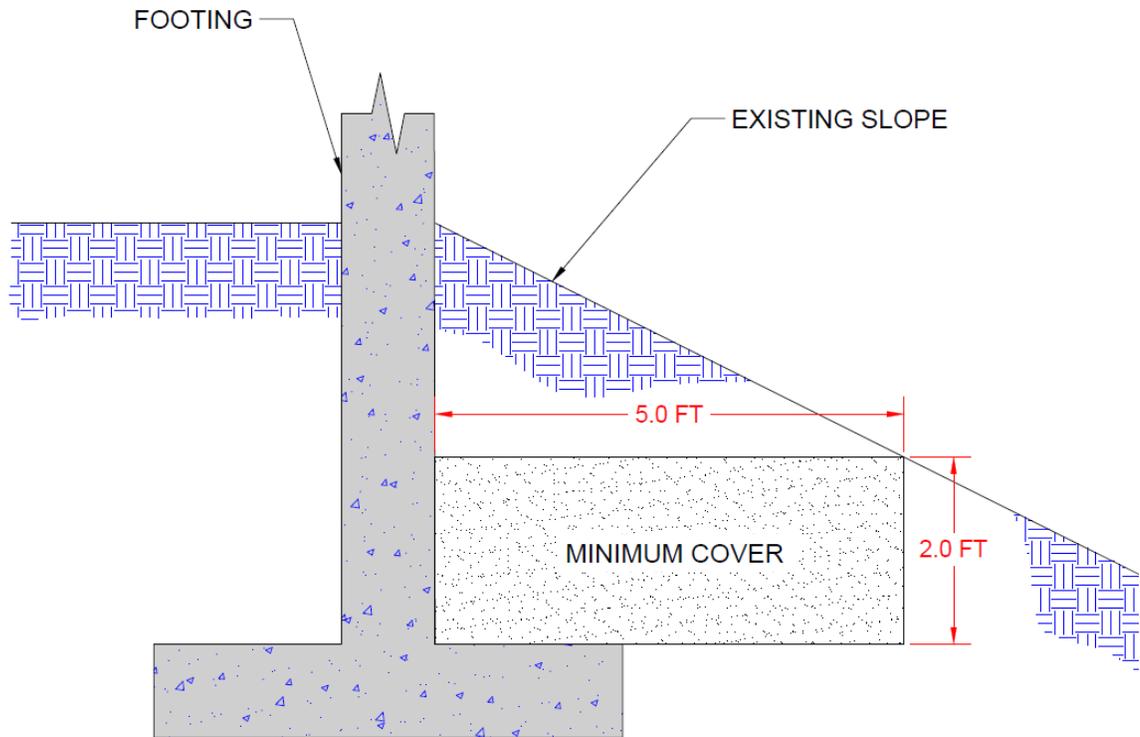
Typical Footing Embedment Diagram Adjacent to Slopes
